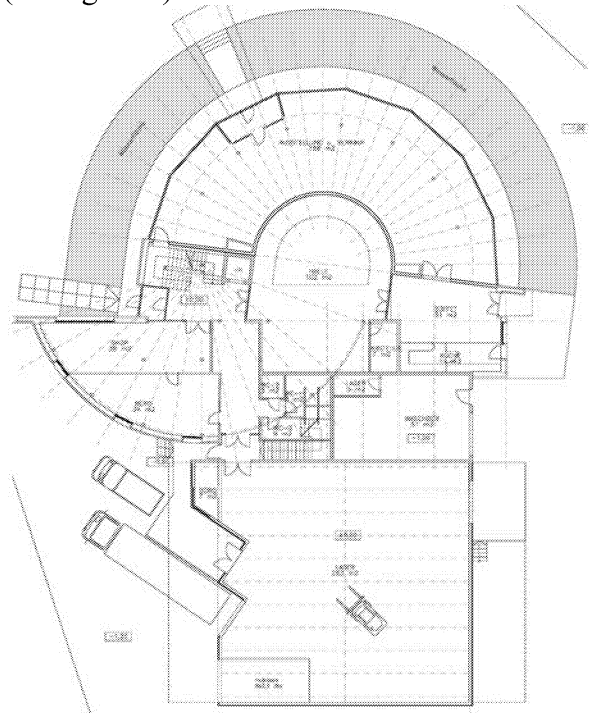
Architectural plan view of the office building Christophorus Building (ground floor)
